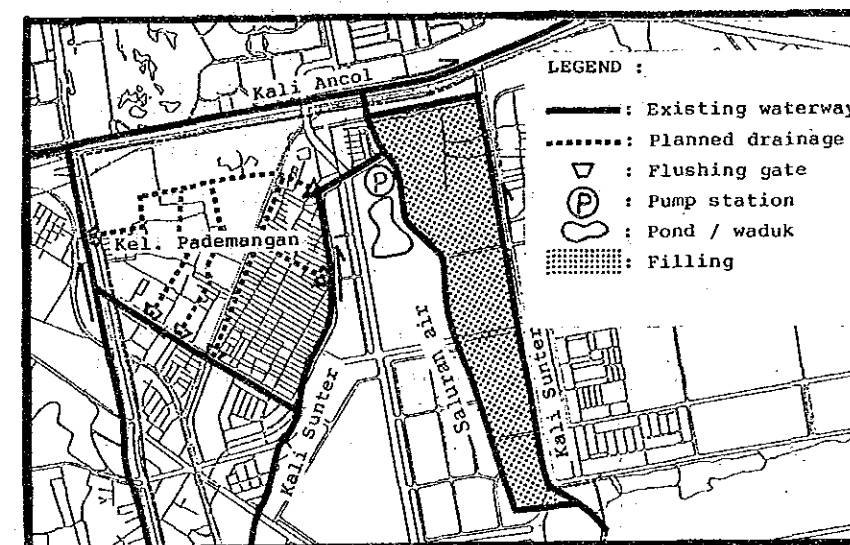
Conceptual plan of Flood Control and Drainage System
